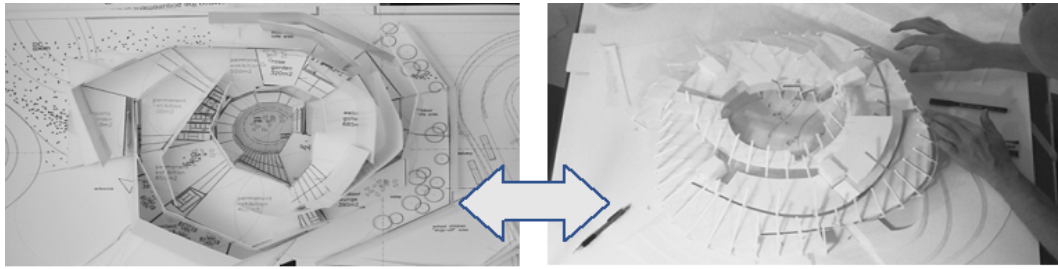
Working with Plan and Elevation Drawings Strategy (Mills, 2011).
